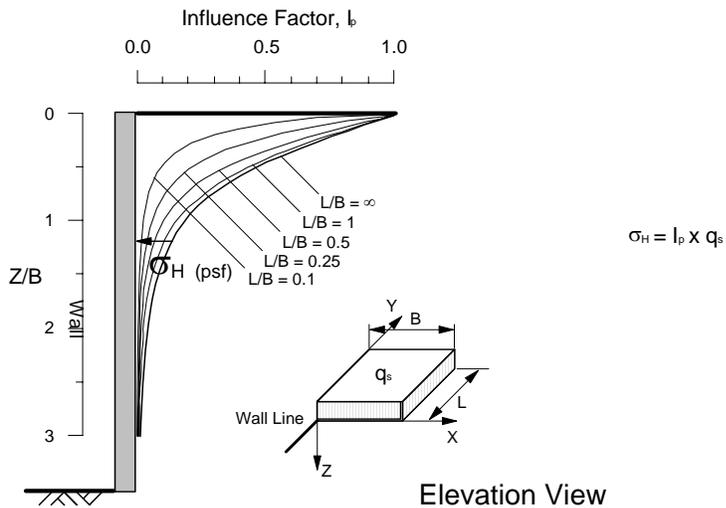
Surcharge loading for yielding walls (not drawn to scale, USN 1986)
